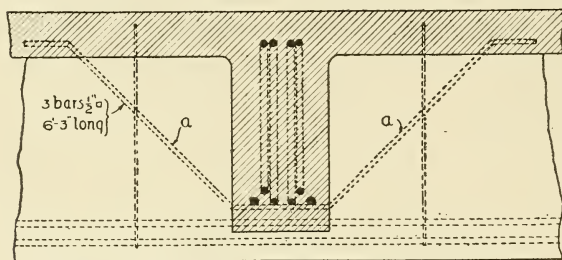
Detail of Reinforcement at Junction of Beam and Girder.
